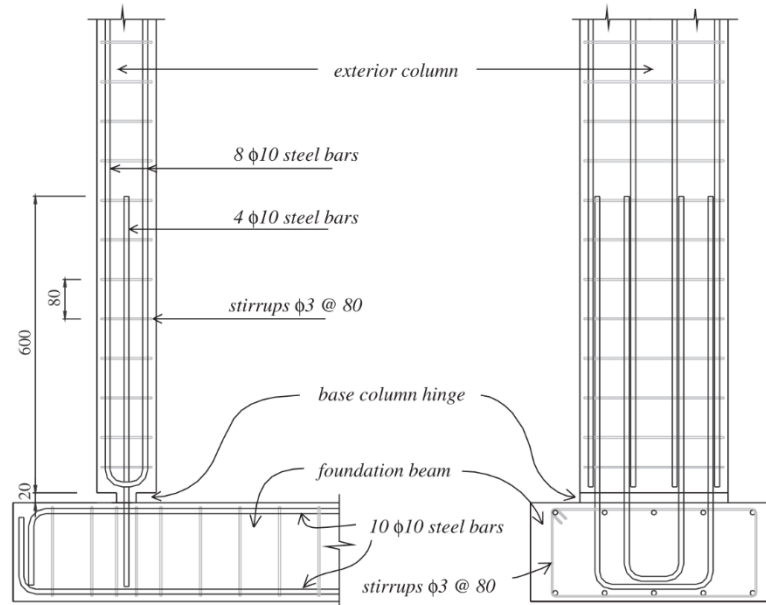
Reinforcing detailing at the base of exterior columns (Toranzo et al. 2009).
